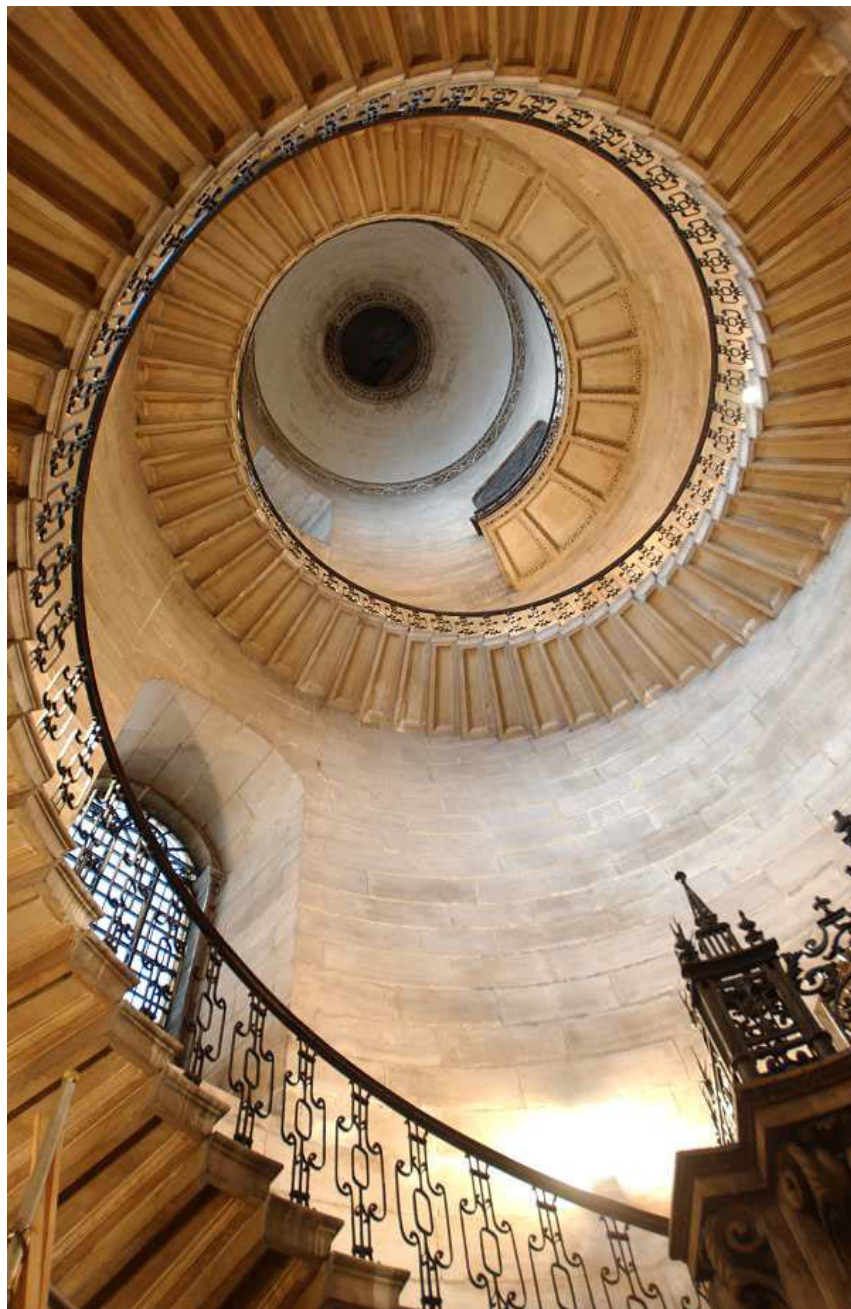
Geometric Stair, looking upwards from the bottom, before cleaning started (A Chopping, MoLAS)
